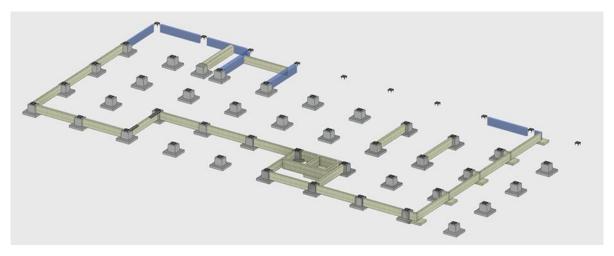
Overview of the precast foundation elements in AAM concrete
